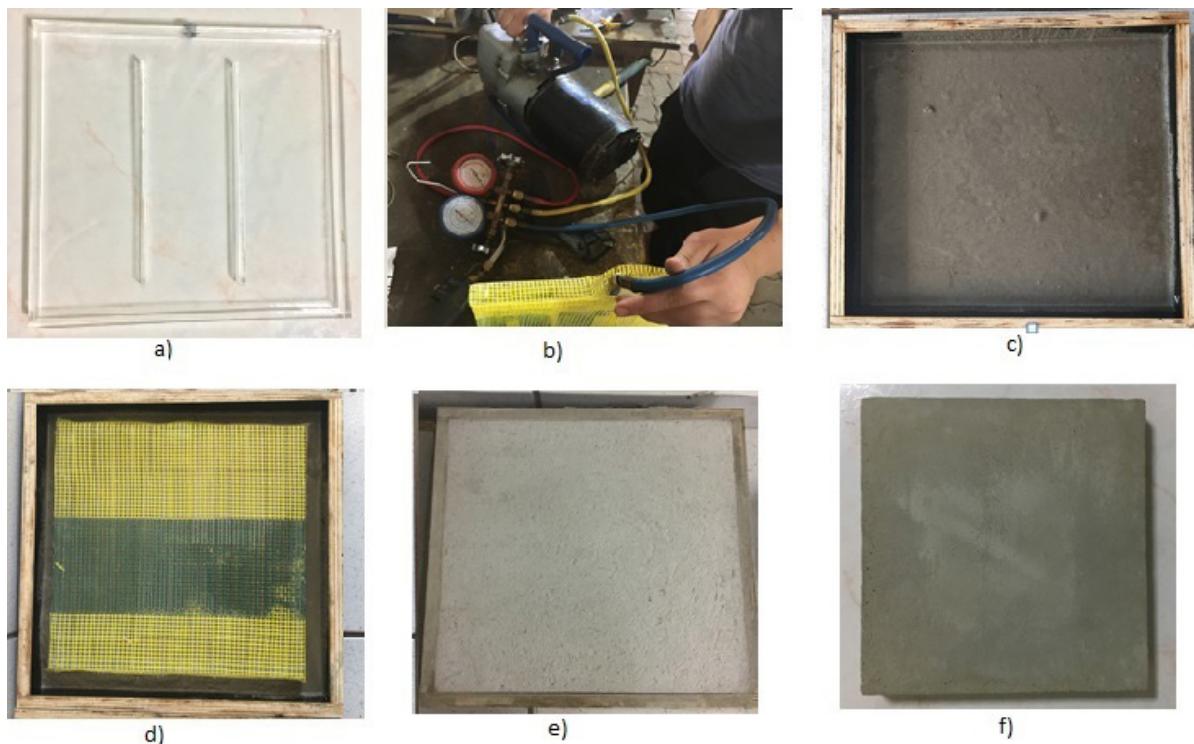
| Execution of the vacuum coating plate: a) Acrylic plate with laser cutting technology; b) Compressor and manometer for withdrawal of air - vacuum; c) First layer of mortar; d) Insertion of the acrylic box with vacuum layer wrapped with glass fiber cloth; e) Second layer of mortar; f) Final proposed element.
